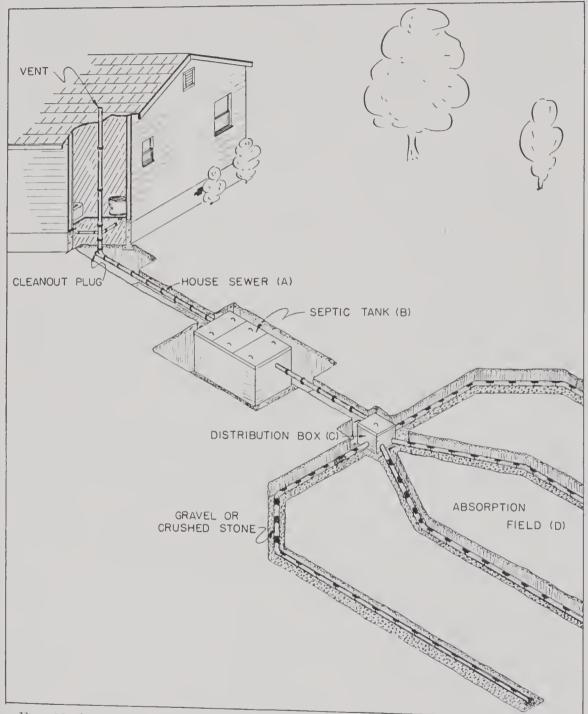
Septic tank sewage disposal system. (Courtesy, John E. Kiker, Florida Engineering and Industrial Experiment Station.)
